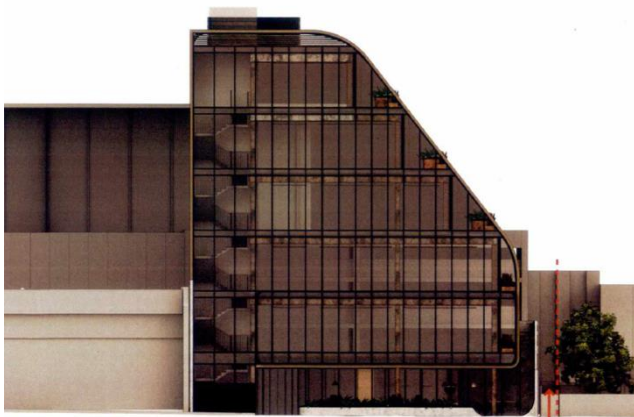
Artist's impression of No. 9 Kingston Street (source: PLN19/0025 advertised design report))
